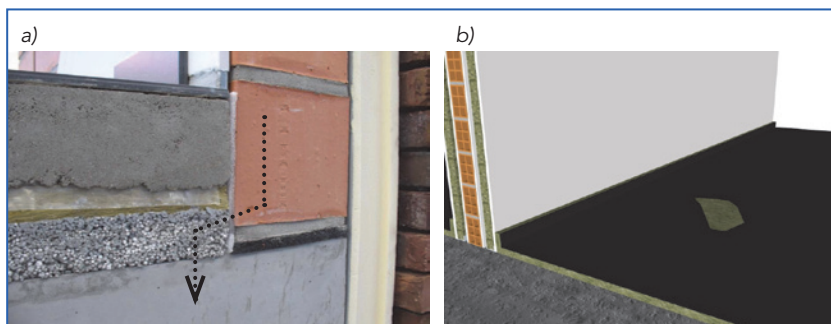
a) Flanking strips must separate the floating floor from the walls. In addition, when resilient layers are placed below the separating wall, flanking strips must be used to separate any level screed installed under the floating floor to avoid any possible transmission path such as the one shown in the red arrow. b) Bad installation of an elastic layer, which is punctured due to dirt, debris, etc.
